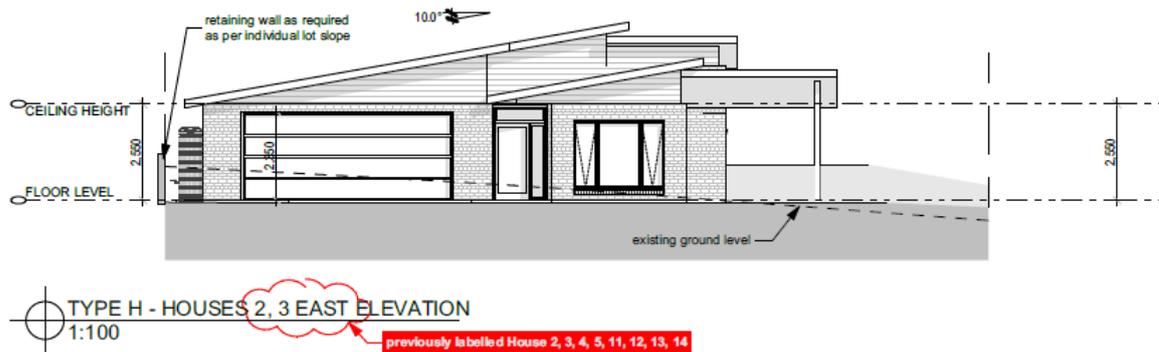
Eastern Elevation of Dwellings 2 & 3
